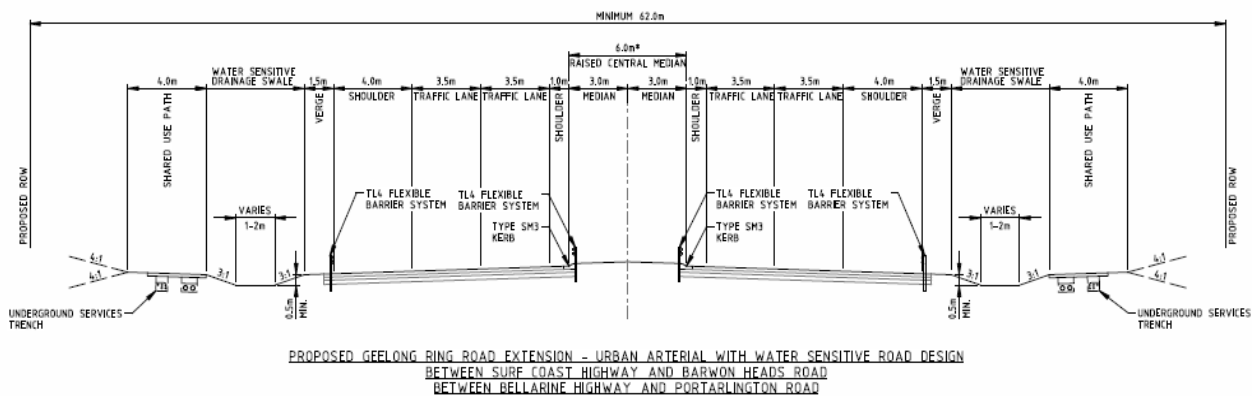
Typical Cross Section – Ultimate Bellarine Link
